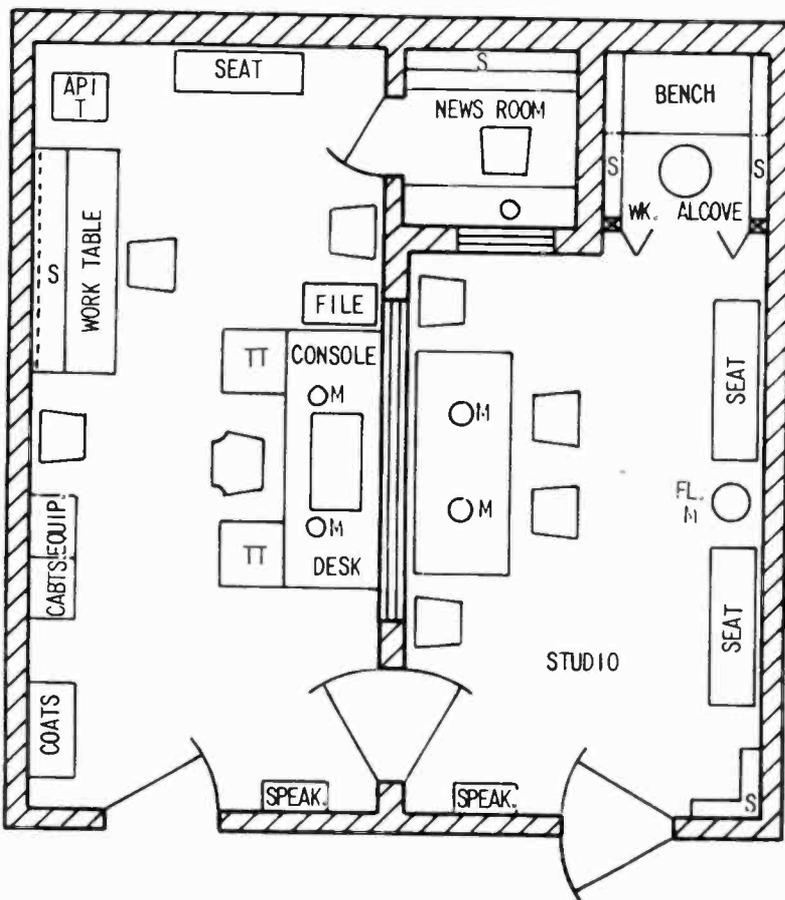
Floor plan of the WPAA-FM radio facilities.
